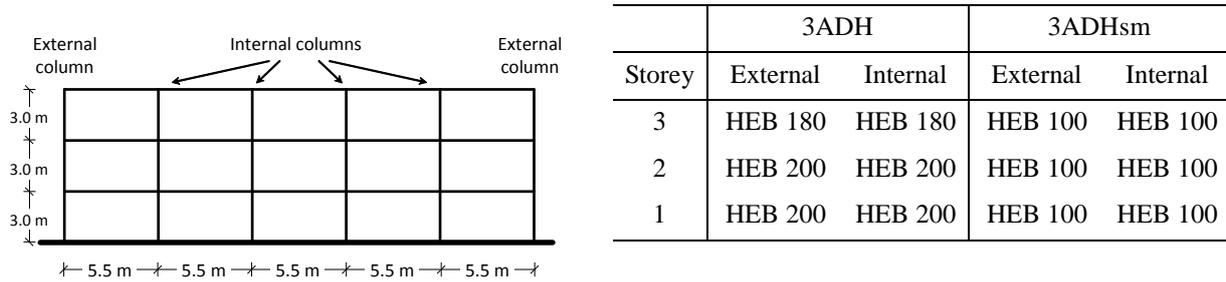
Geometrical scheme and column cross-sections of the 3ADH and 3ADHsm frames.
